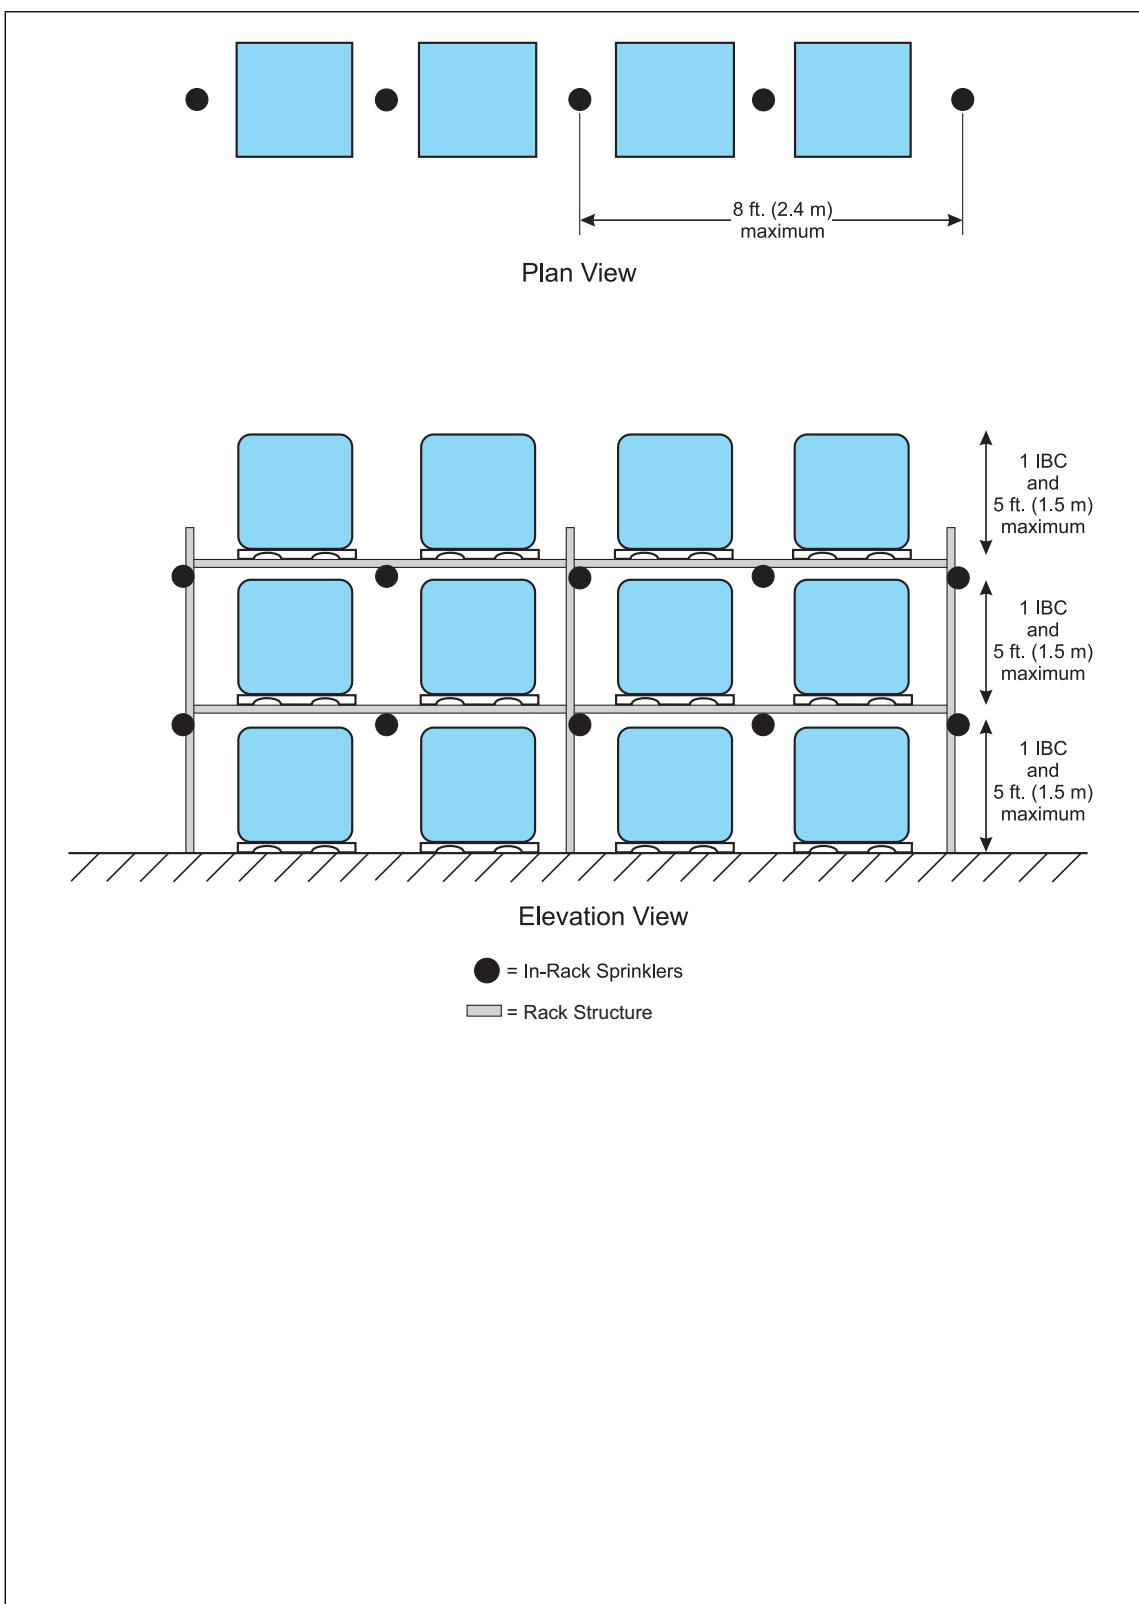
Single-row rack sprinkler layout: IBC protection scheme
